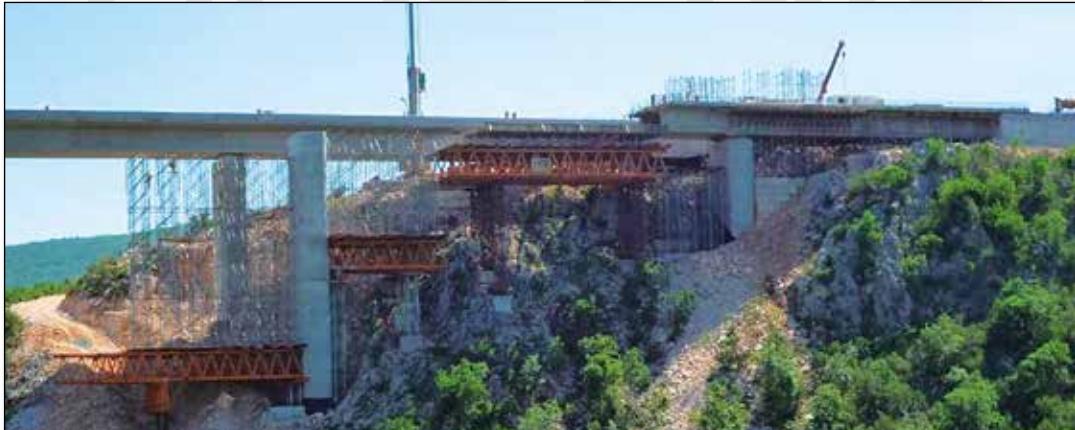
Construction stage, construction of span structure of Trebižat bridge on scaffolding
